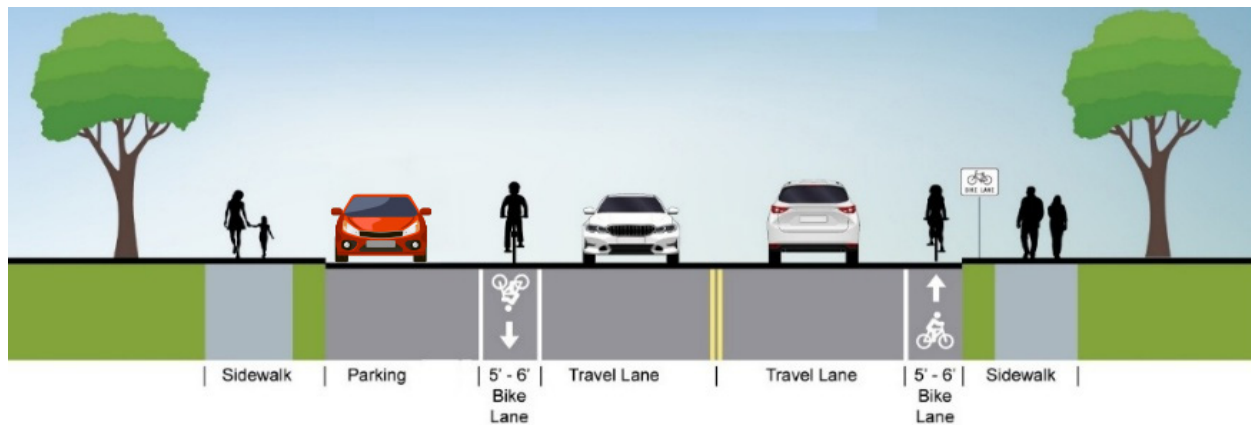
Typical cross-section of a street with Class II bike lanes
